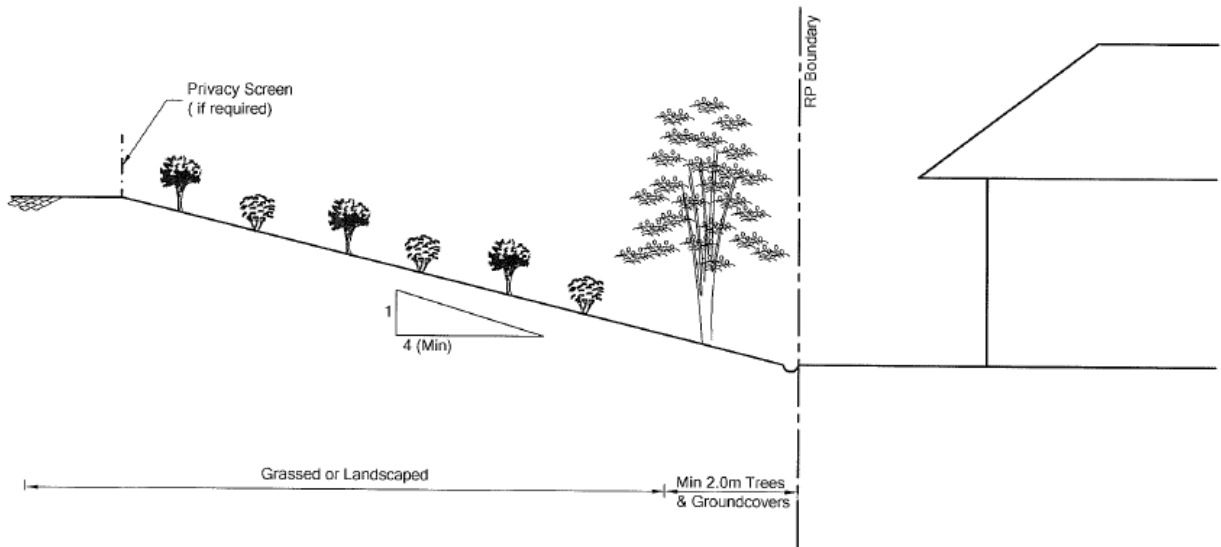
Fill embankment: landscaped batter with 1V:4H slope
